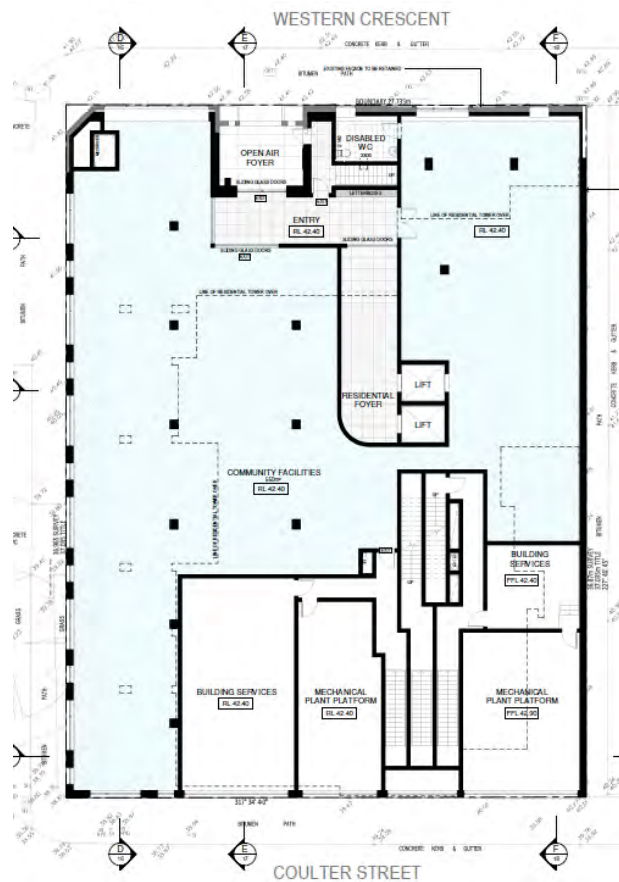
Extract of the ground floor submitted with the original architectural plans for LDA2021/300
